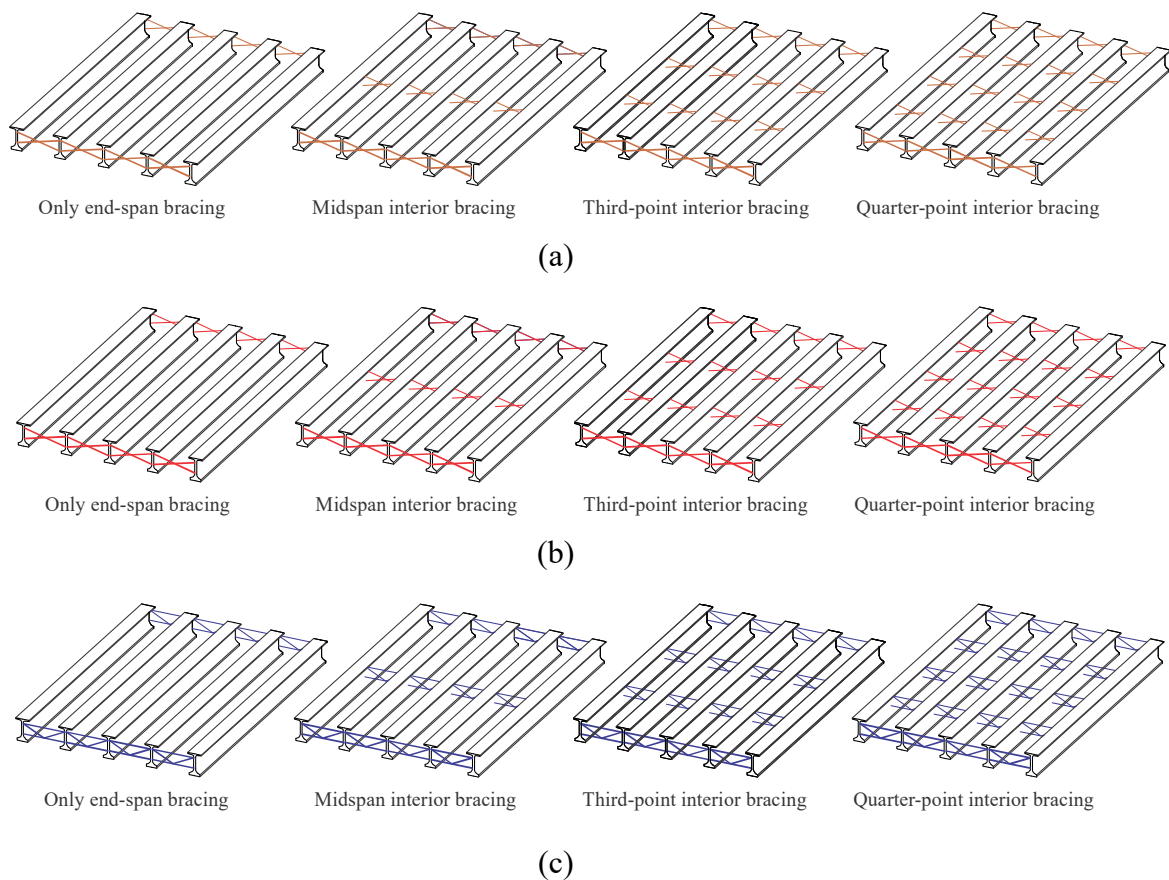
Brace configurations considered in the parametric study for 5-girder bridge systems with: (a) Timber X-bracing; (b) Steel X-bracing; (c) Steel K-bracing
